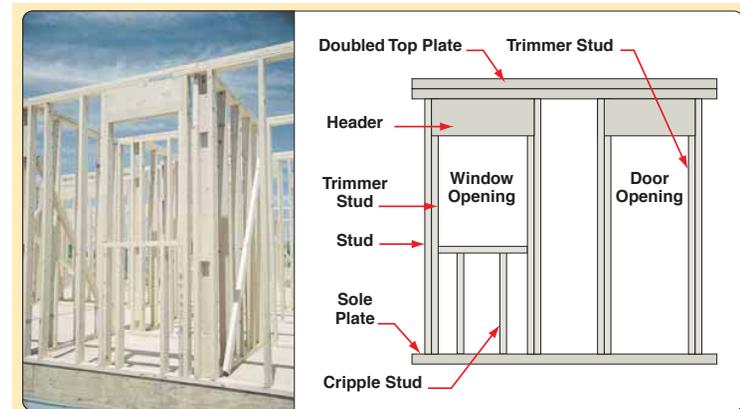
This photo shows many of the parts of a wood-framed wall.
